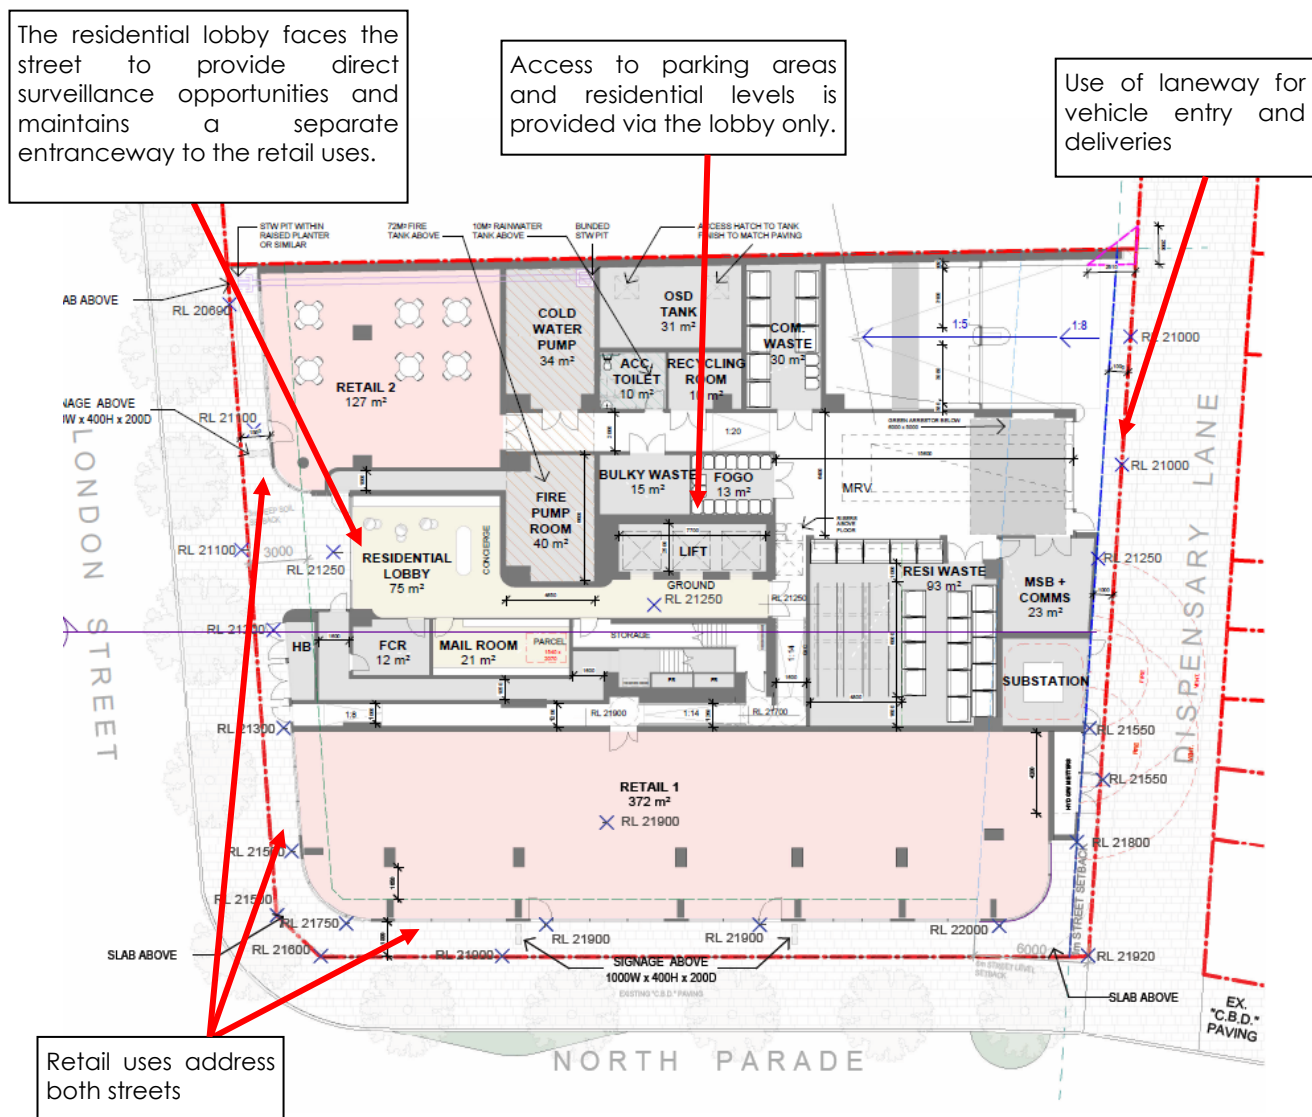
Extract of the ground floor plans (Woods Bagot, 2026)
